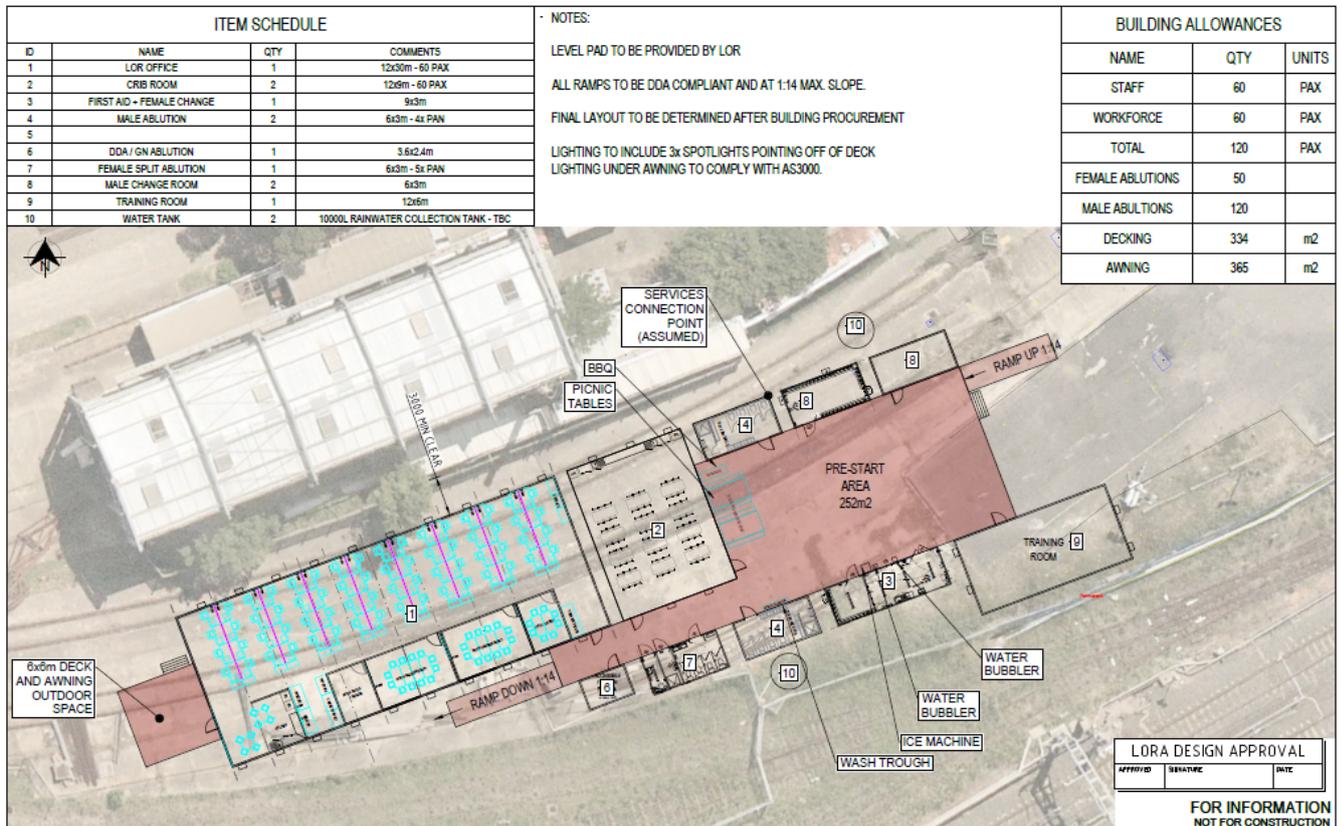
Office compounds for the Little Eveleigh Street ancillary facility
